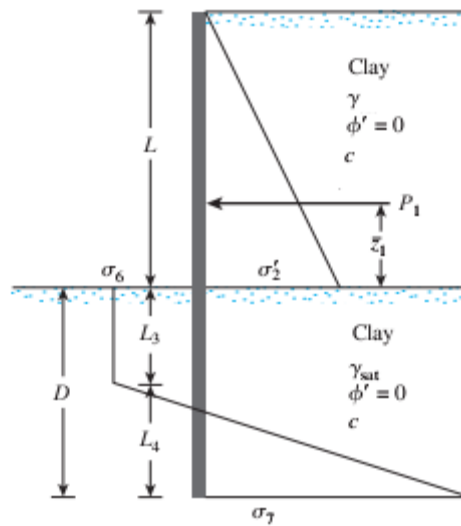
Sheet pile-wall penetrating clay. Case I
